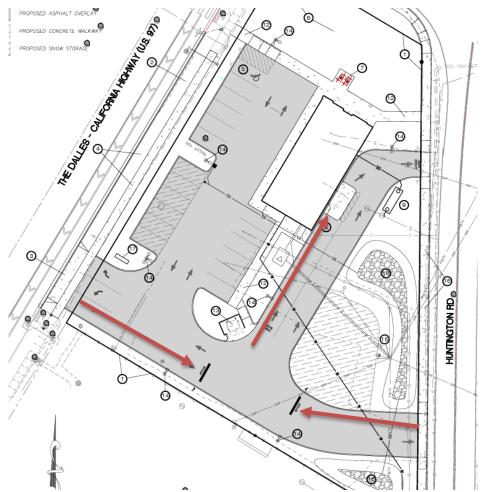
Applicant's site plan, red arrows indicate access to drive-thru
